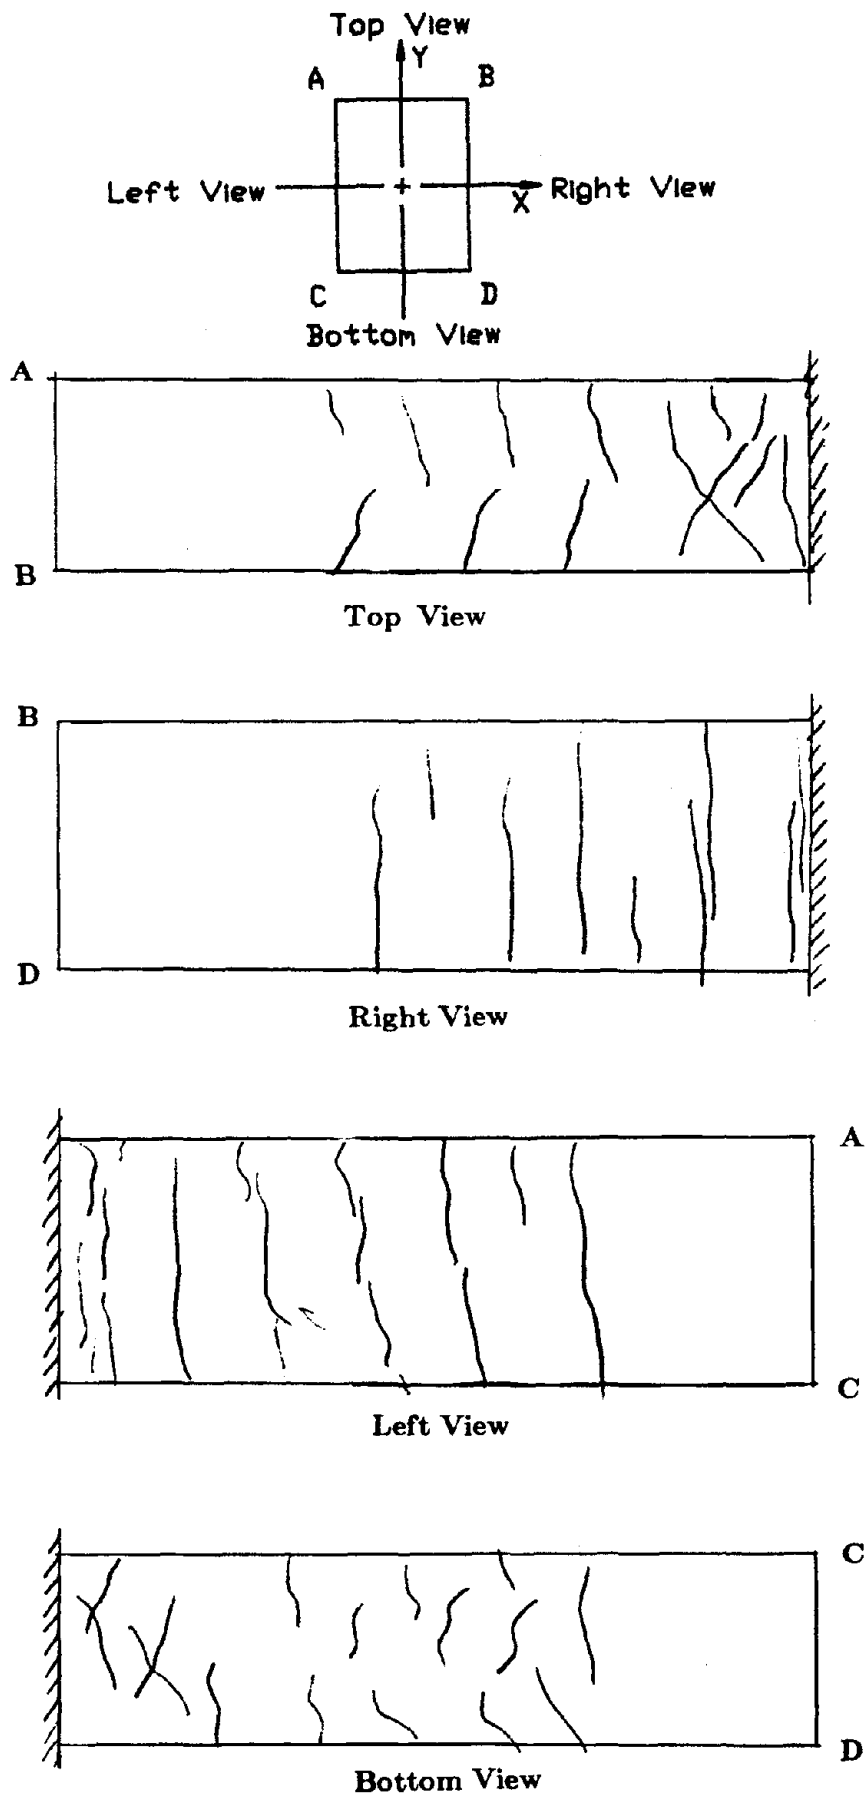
Crack Patterns at Conclusion of Testing - Specimen 1
